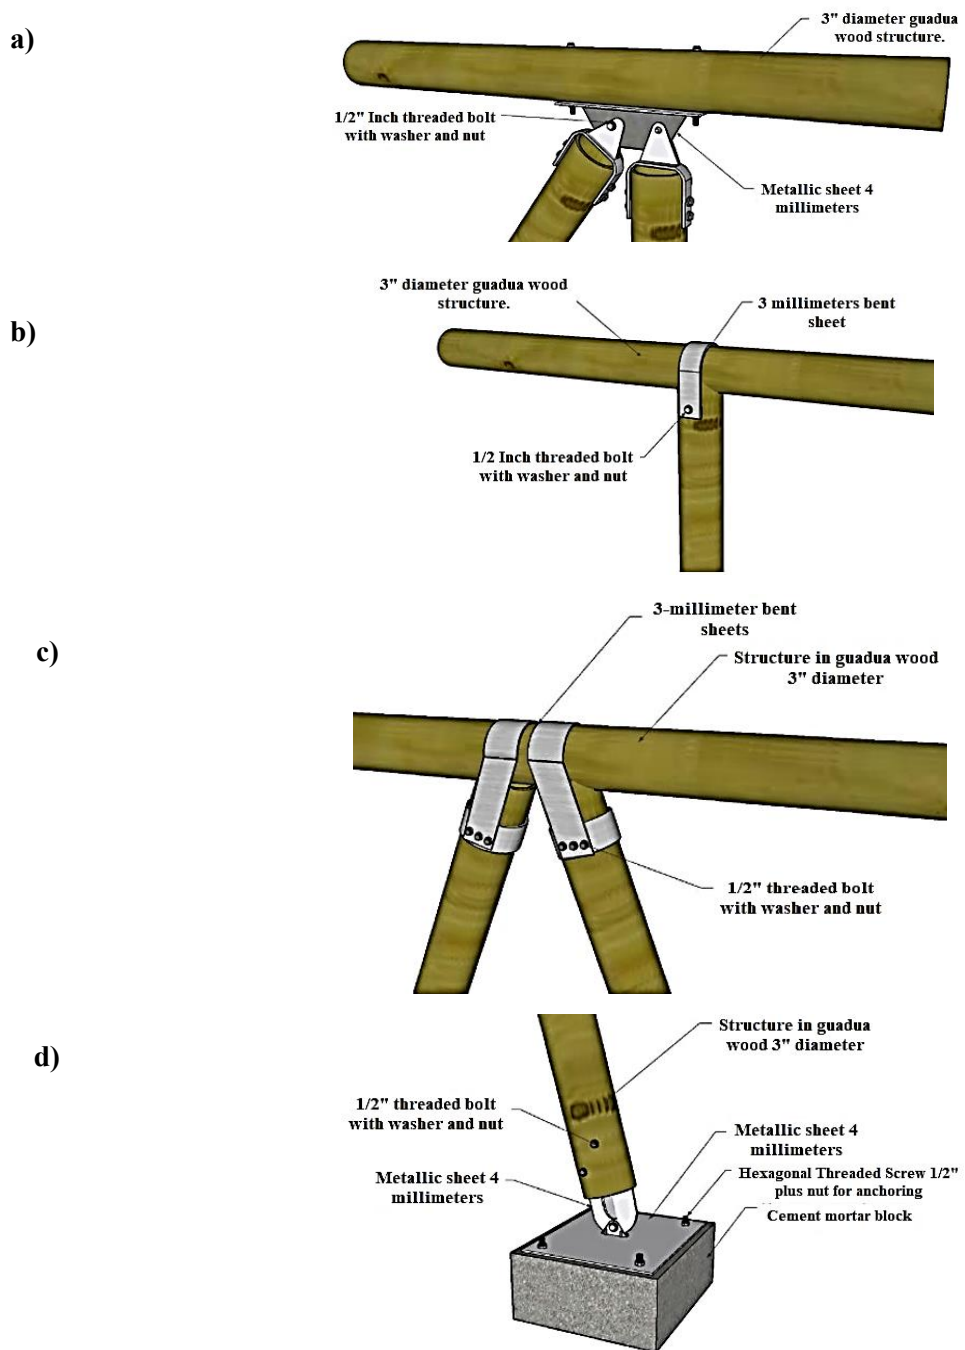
Main joints and connections of the bridge structure. a) join couple with the horizontal bar, b) Fixation, c) Reinforced union and d) Couple with the metallic sheet. Source. Authors
